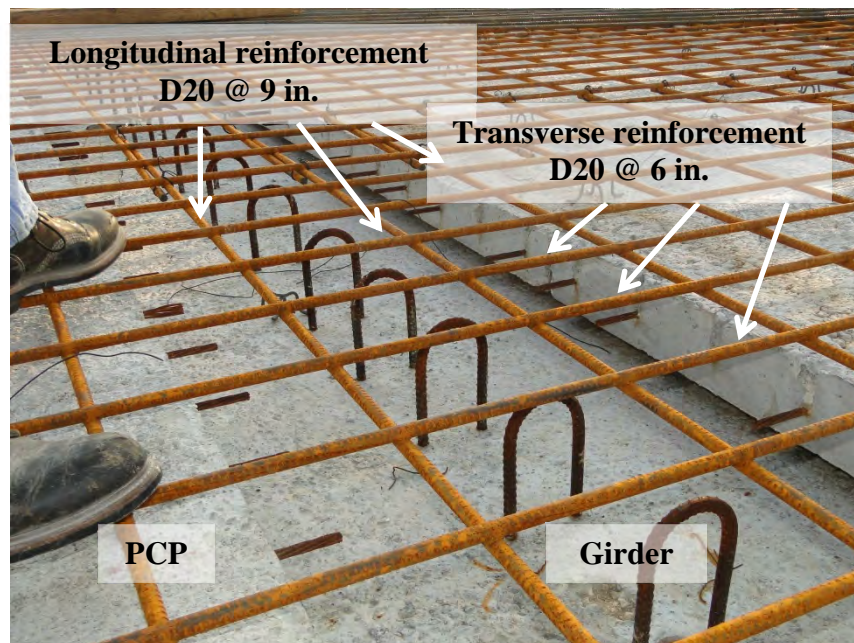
Typical placement of reduced welded-wire reinforcement, Lampasas River Bridge
